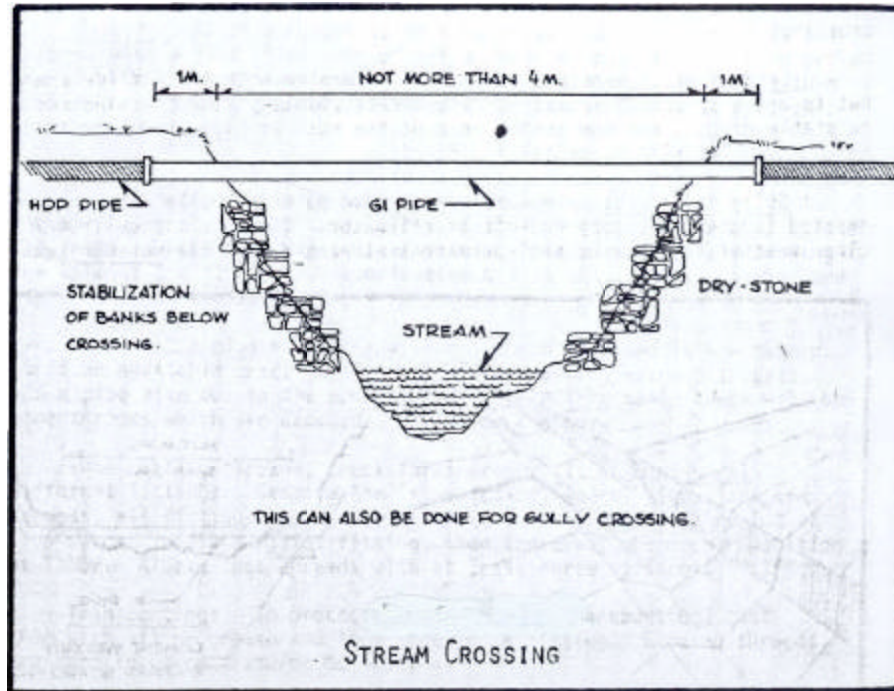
Galvanized pipe gulley crossing (Source: Jordan, 1980)
